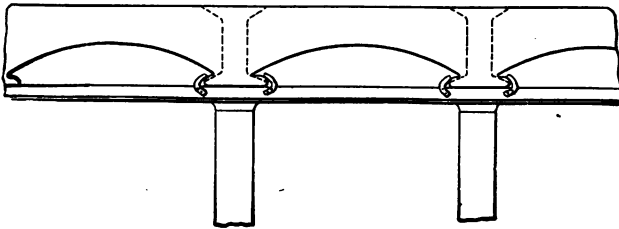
Molding running on arched ceiling fastened to I-beams.
